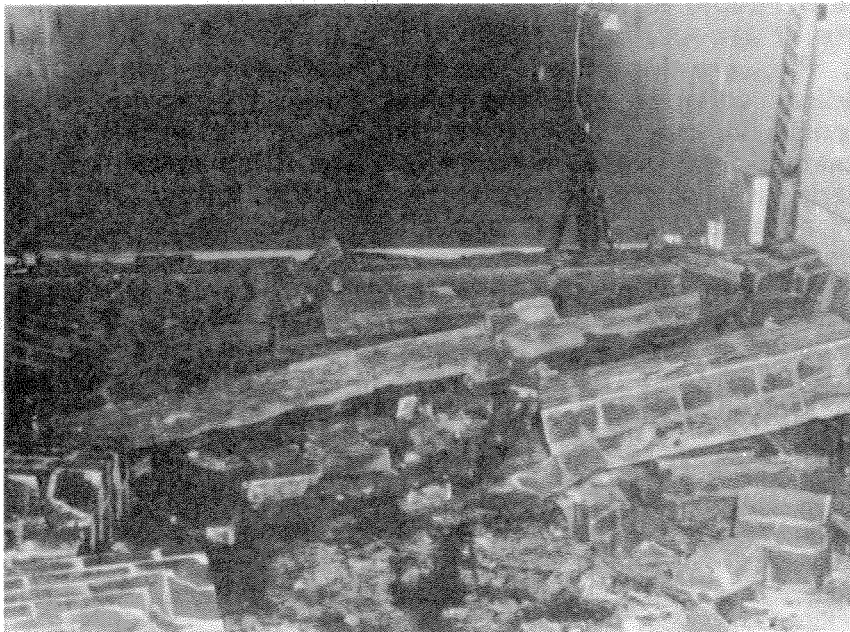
A large hole in the brick wall of the building, showing the extent of the damage. The hole is approximately 10 feet wide and 8 feet high. The surrounding wall is made of light-colored bricks. The interior of the hole is dark, and the surrounding wall is made of light-colored bricks.
